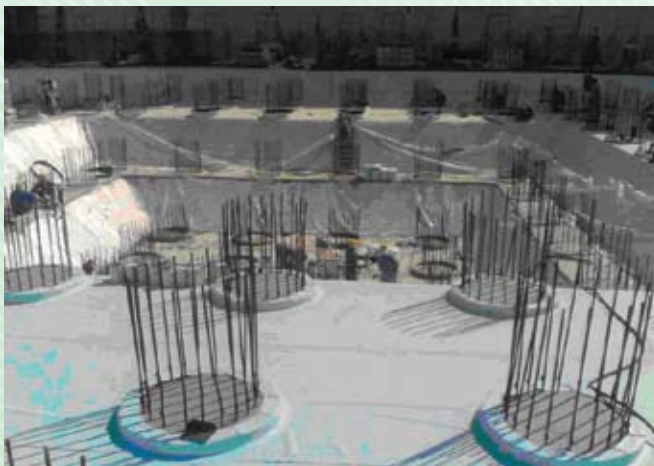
Waterproofing at the foundation of Dubai Mall Hotel [1]
